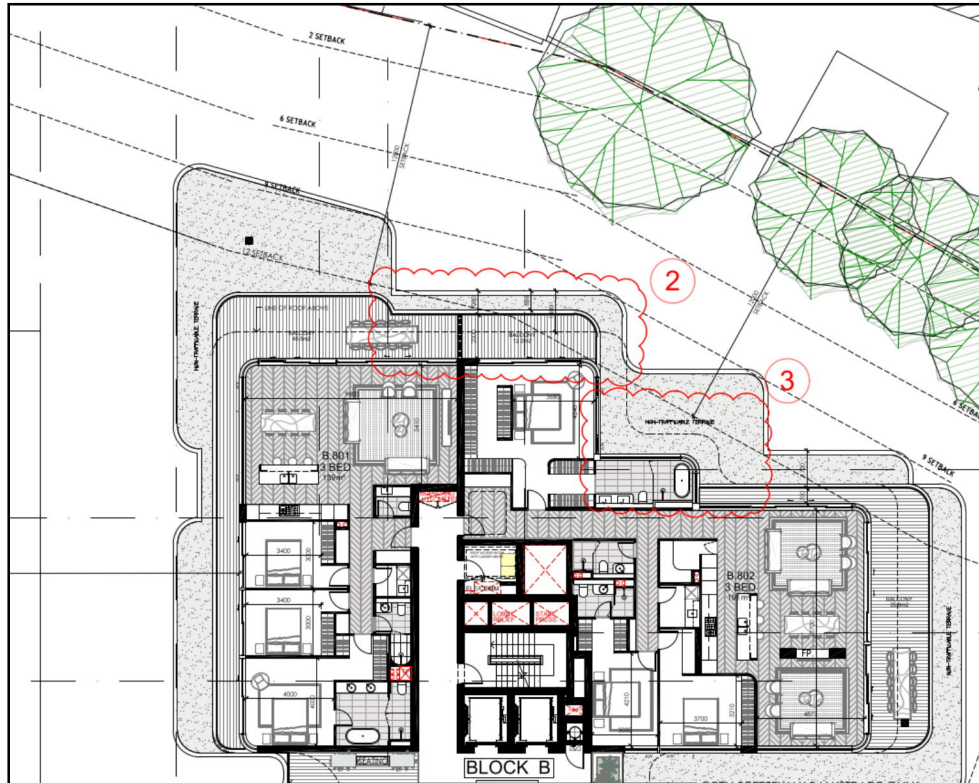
Revised balcony depths / roof Apartments B8.01 and B8.02
